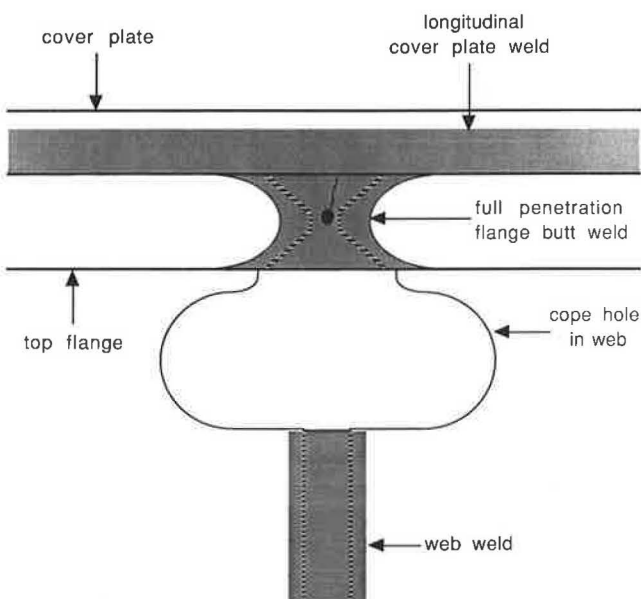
Crack propagation from flaw within root of flange splice butt weld.
